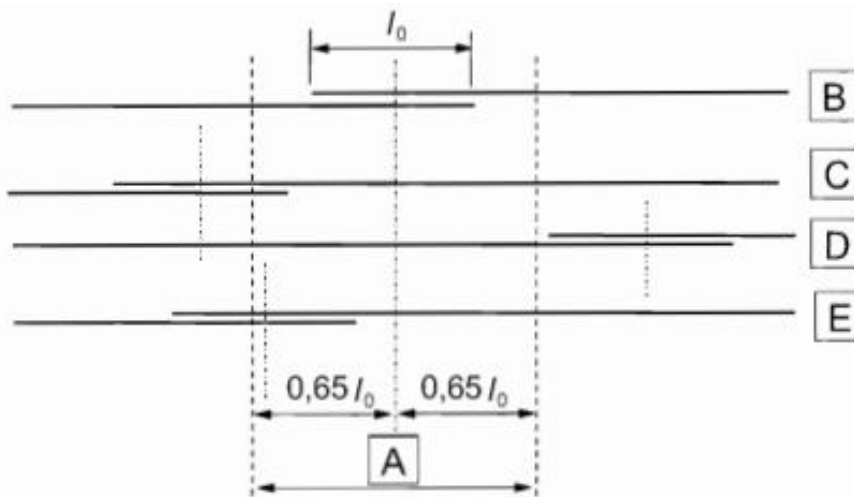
Avoiding too many lapped slices in one cross-section (according to EN 1992-1-1, Section 8.7.3).
